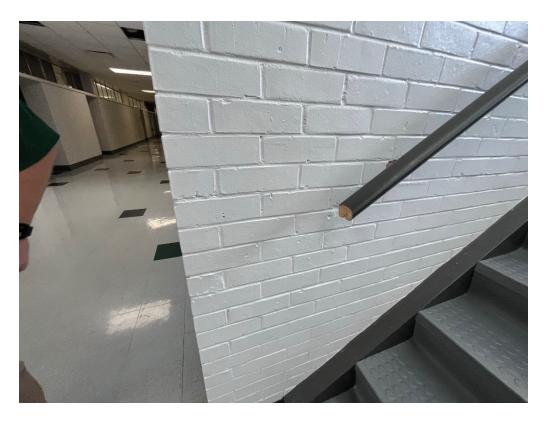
Handrail Extension not Substantial; needs to be replaced
